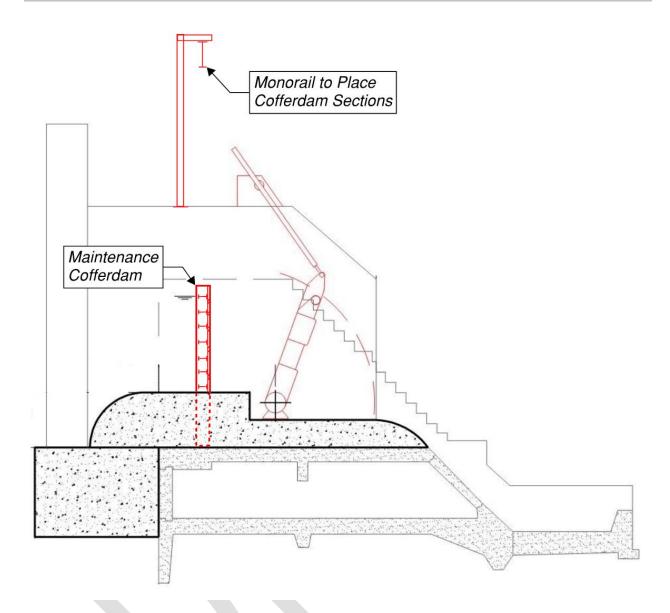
Conceptual Arrangement of Steel Columns and Horizontally Spanning Panels
